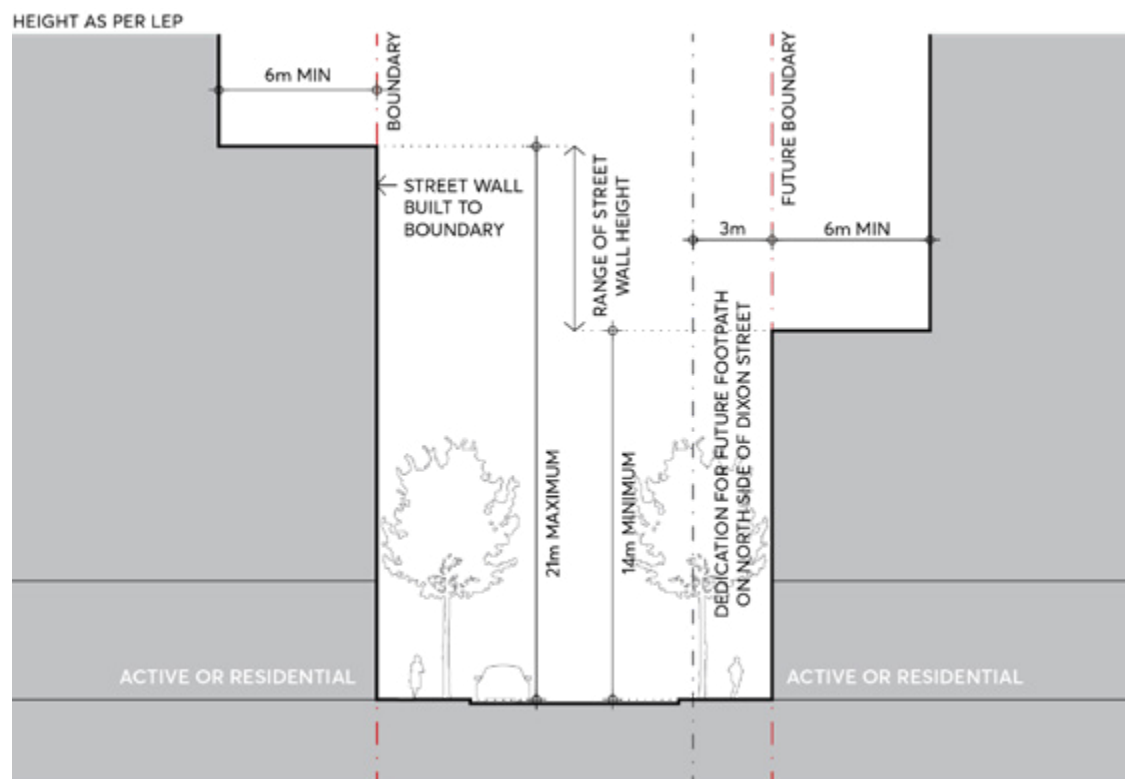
Dixon Street (Section B) Setbacks and Street Wall Height
